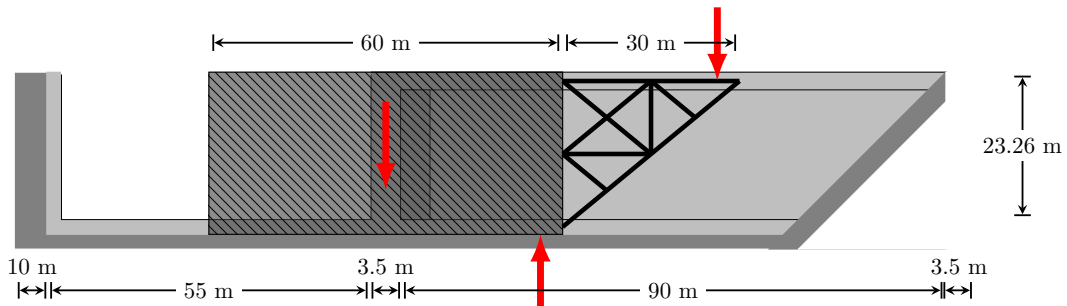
Longitudinal cross-section A-A of the bascule rolling door (straight bottom plate)
